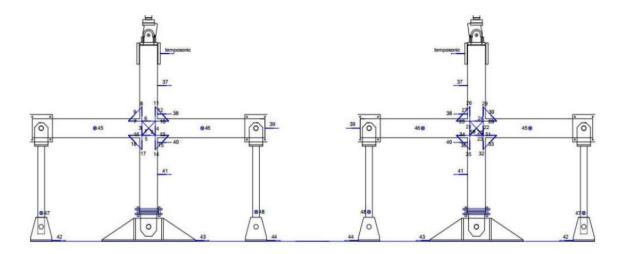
Surface Instrumentation/LVDT Arrangement, Front (left) – back (right)
